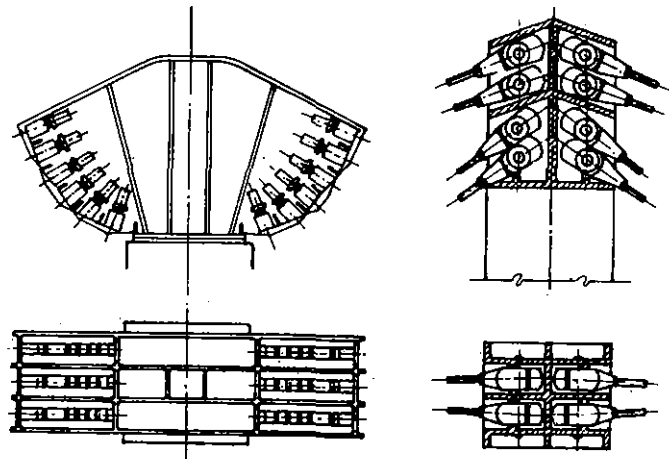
Incorporated relay device. Grouped anchorages (FAN system)
